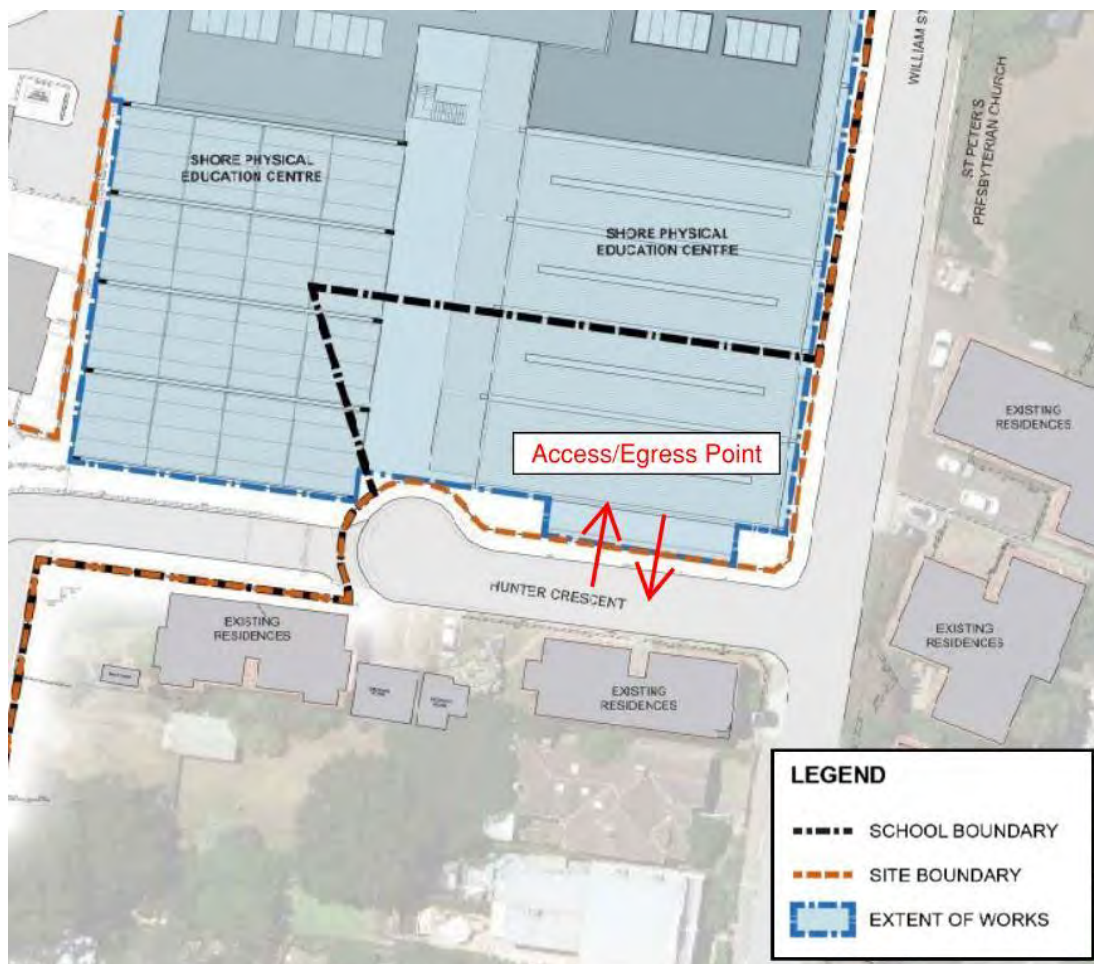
Proposed Loading Facility Access Point (Source: Cox Richardson Site Plan, January 2016)
